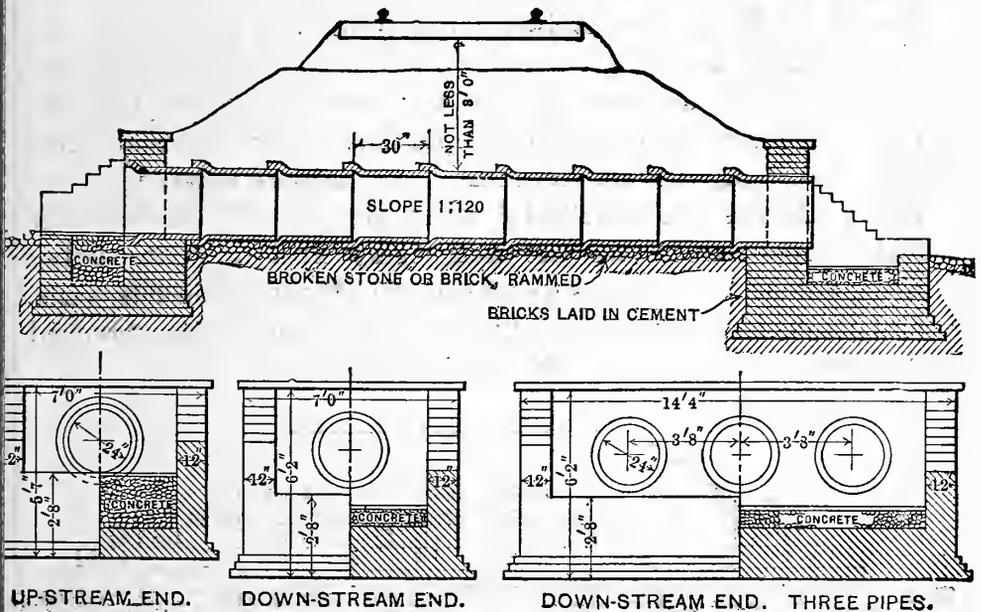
STANDARD VITRIFIED-PIPE CULVERT. PLANT SYSTEM. (1891.)
